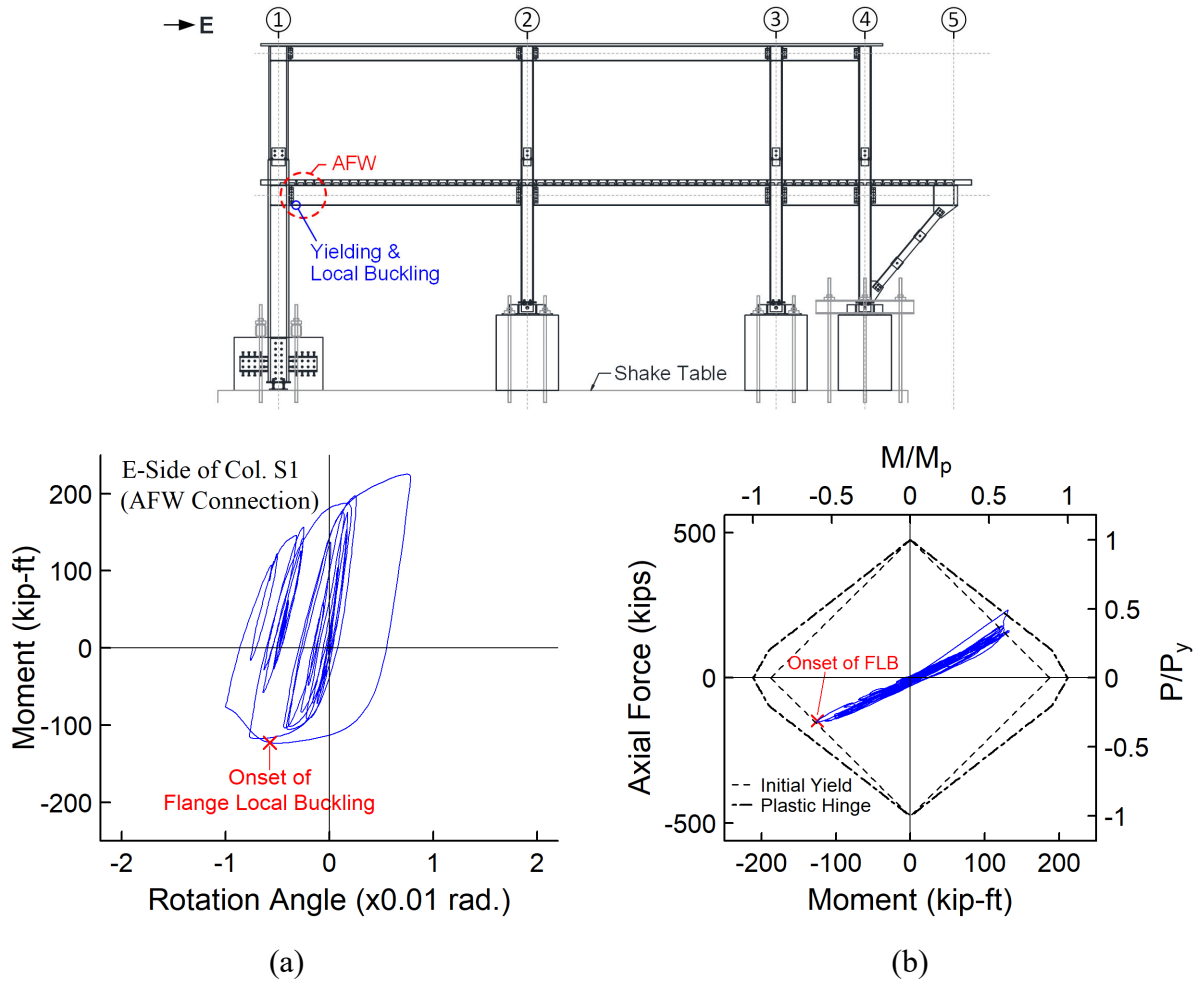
Test 2B-5: (a) Moment-Rotation Relationships of Composite Section and (b) P-M Interaction of Steel Section of South 2<sup>nd</sup> Floor AFW Connection
